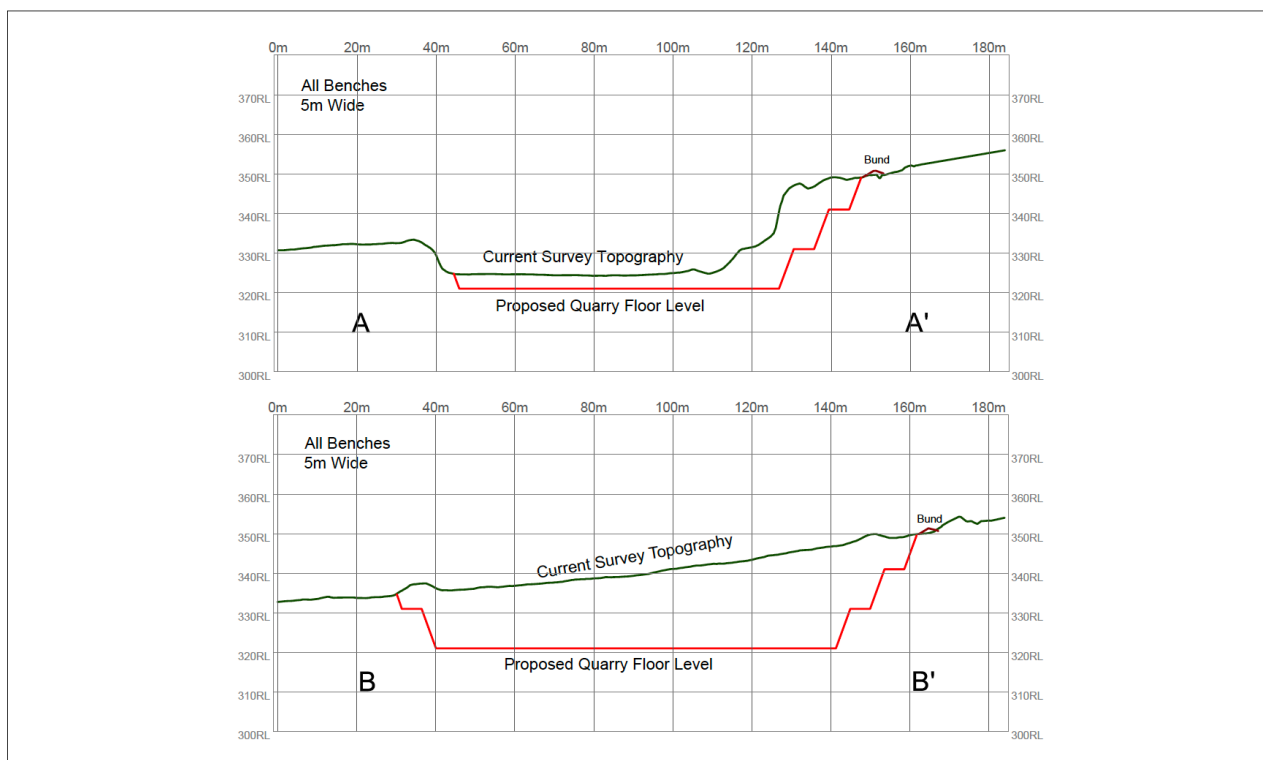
Proposed Quarry Extension Bolgers Pit -Cross-Sections + Long Section
